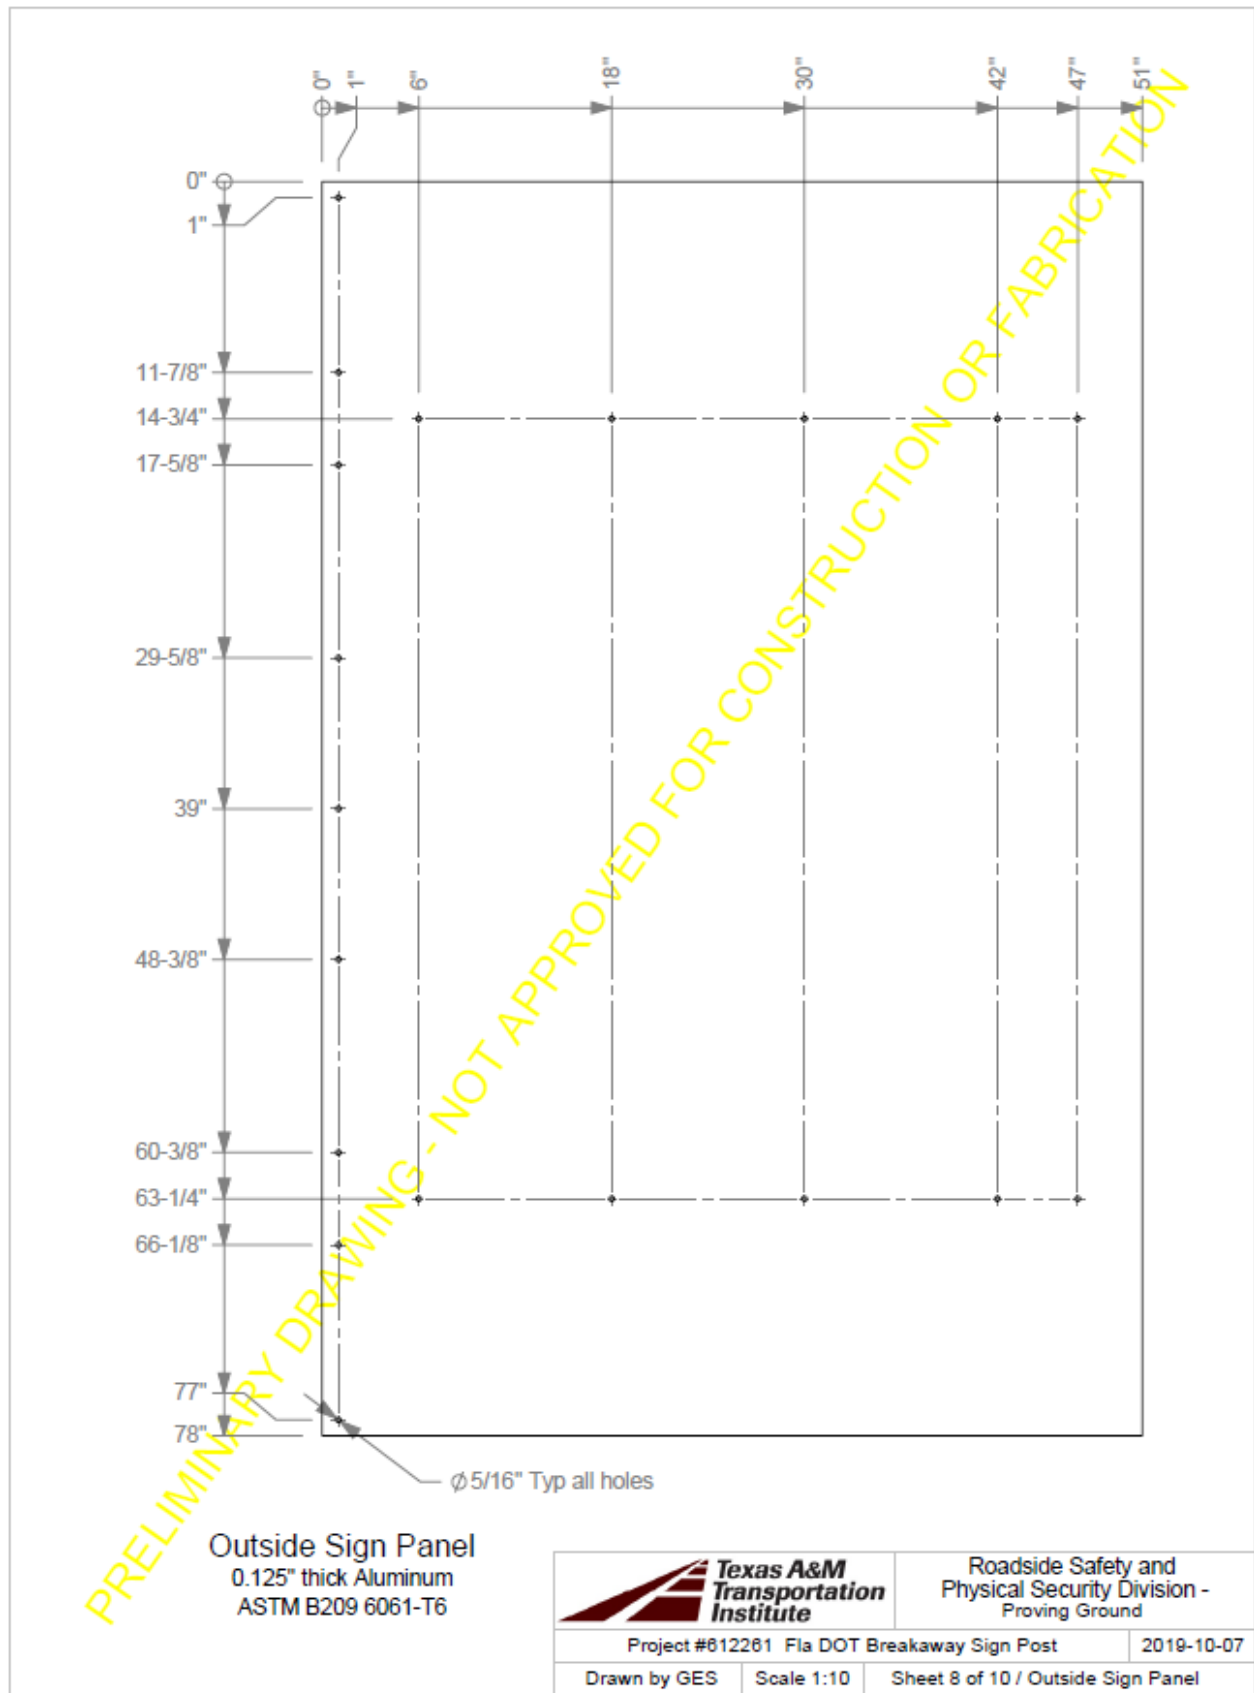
Preliminary Drawing (Sheet 8 of 10).
